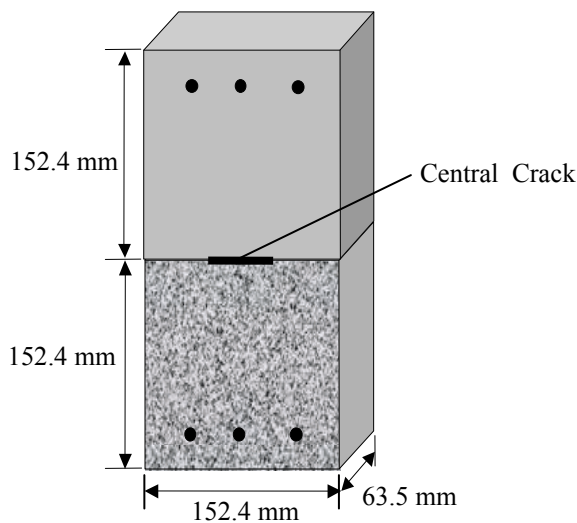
Composite Asphalt-Concrete Specimen Geometry With Central Interface Crack and Normal Loading
